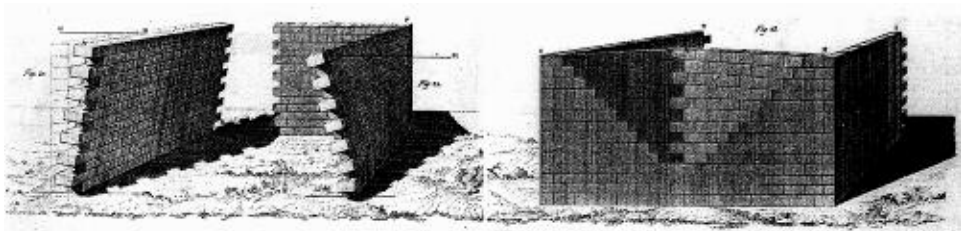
Typical collapse mechanism of masonry walls by out-of-plane behaviour
